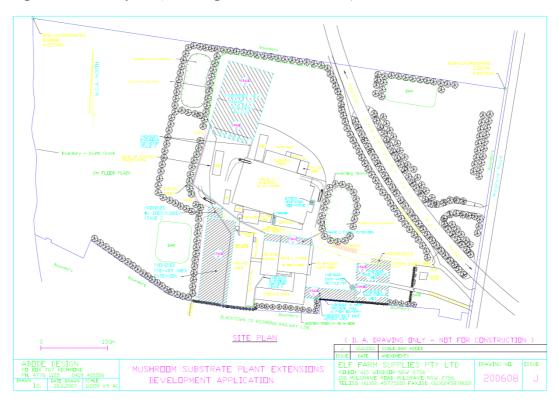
Site Layout (Drawing No. 200608 Issue J)
